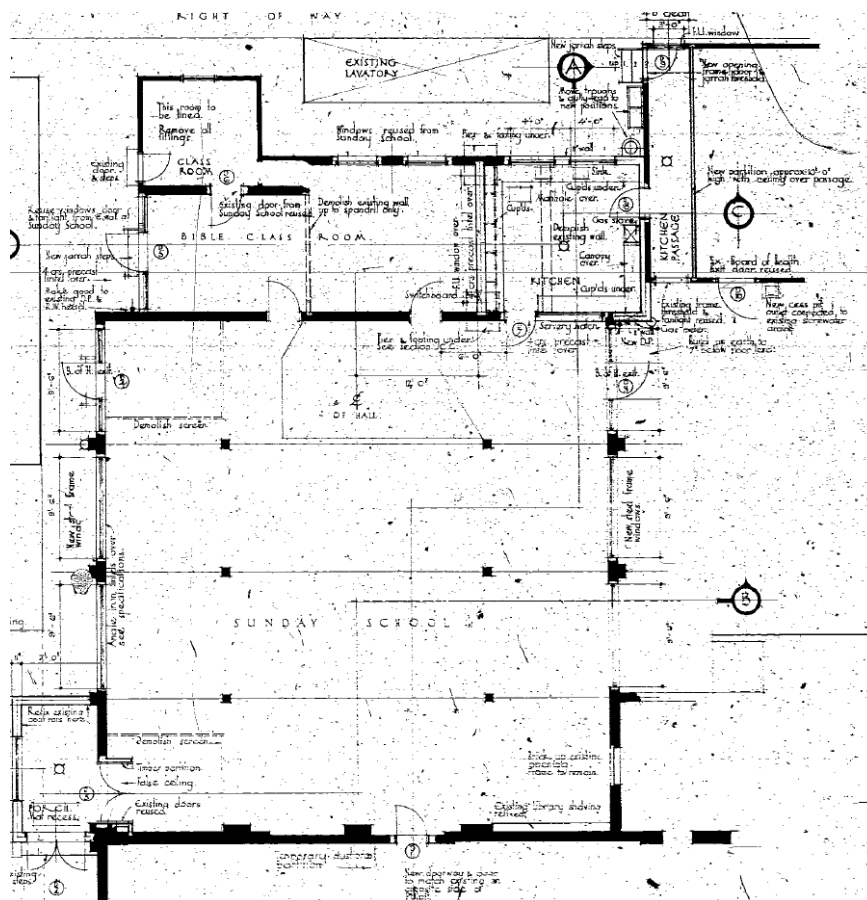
Plan BP13898 dated 1941 showing works to the Sunday School and Bible Classroom. Note the hall appears in the upper right hand corner, although no detail is shown on its use. (Source: Building Permit 13898 for 146 Canterbury Road)
